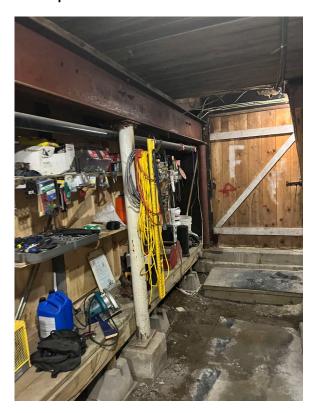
Exposed deteriorated base slab underneath west bleachers.
